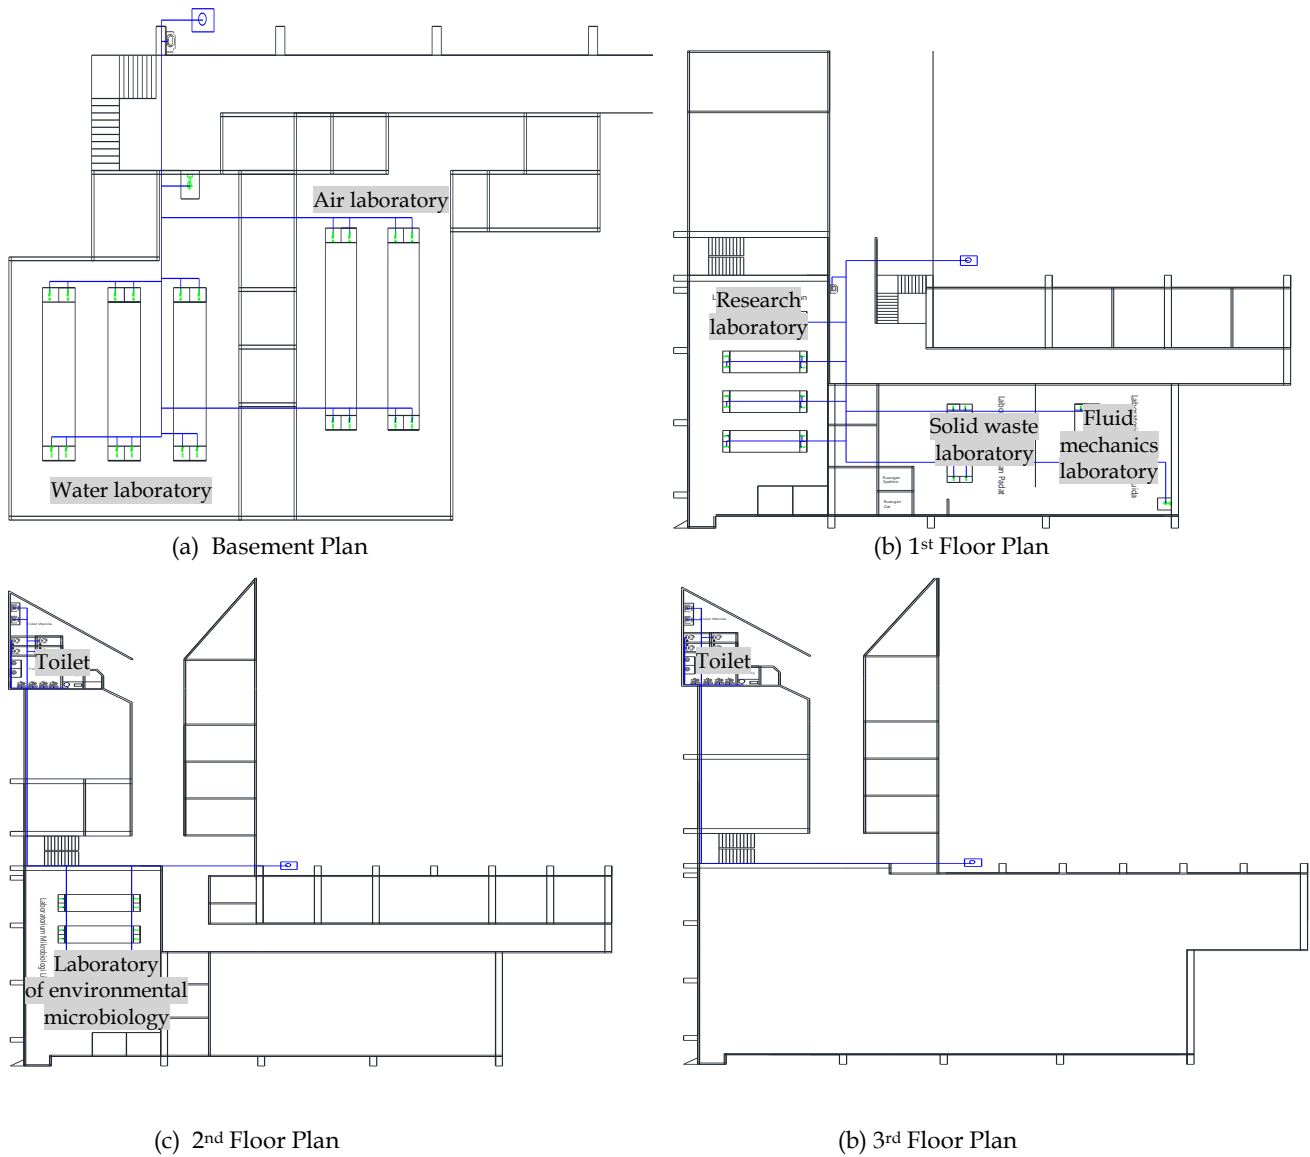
Water Piping Scheme of the Department of Environmental Engineering Building
